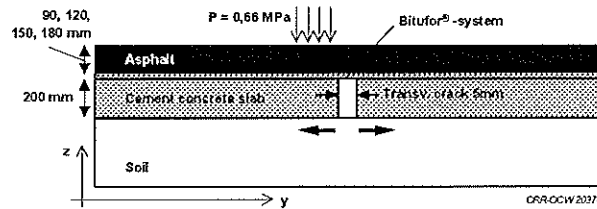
Overview of the road structures considered for the simulation of overlays on lean concrete (thermal movements and traffic).
